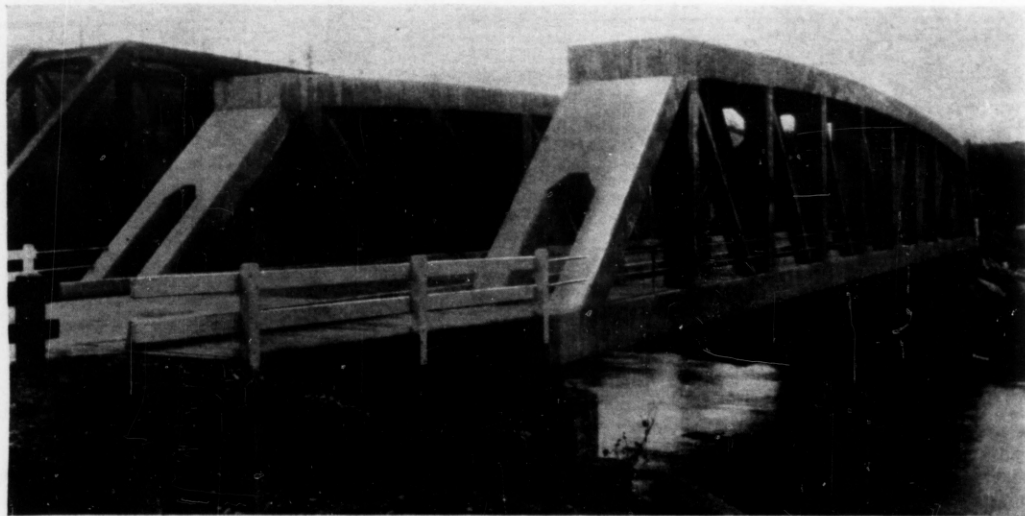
COMPLETED STRUCTURE of new McMillin Bridge near Tacoma, Wash. Reinforced-concrete main span, 170 ft. long, provides largest practical water opening for Puyallup River floods.
